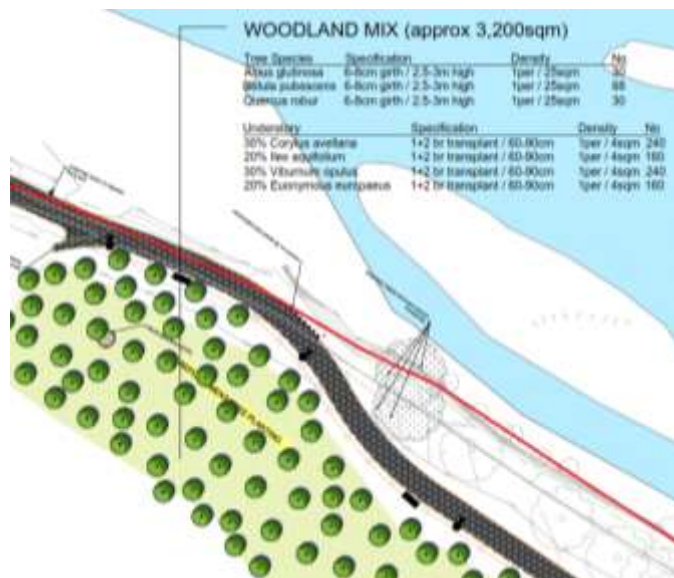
Proposed tree planting area north of Dromroe Student Village
